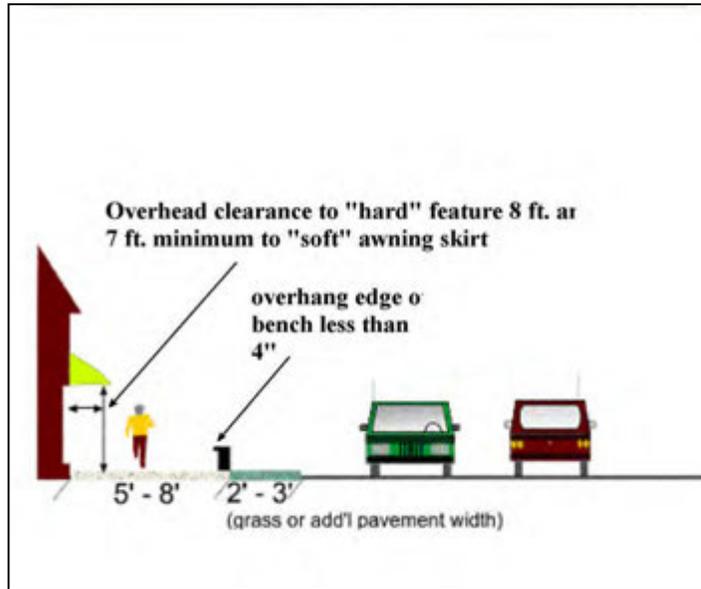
Profile view of building, clear pedestrian sidewalk zone, buffer zone, and street
